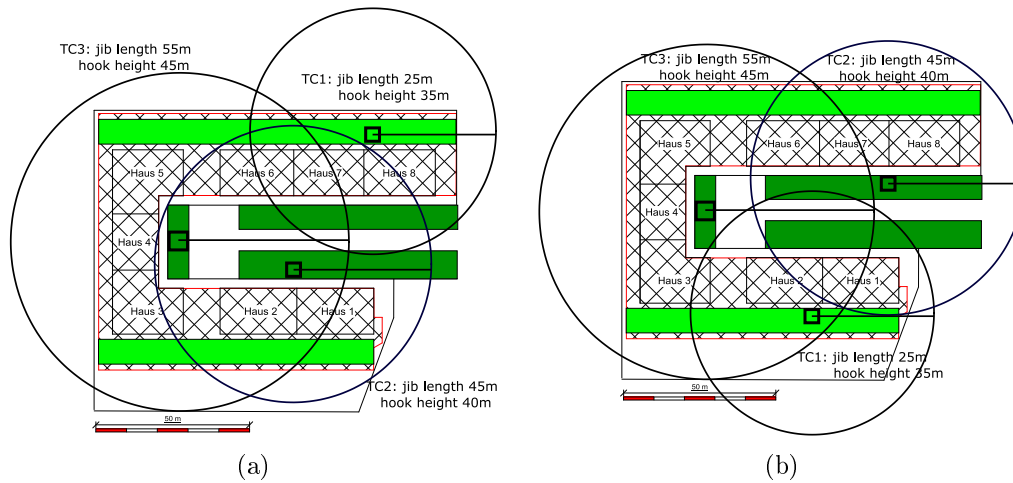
Two possible examples for tower crane setup. Dark green: Usable during the whole construction. Light green: Feasible with opening or sufficient load capacity in basement ceiling.
